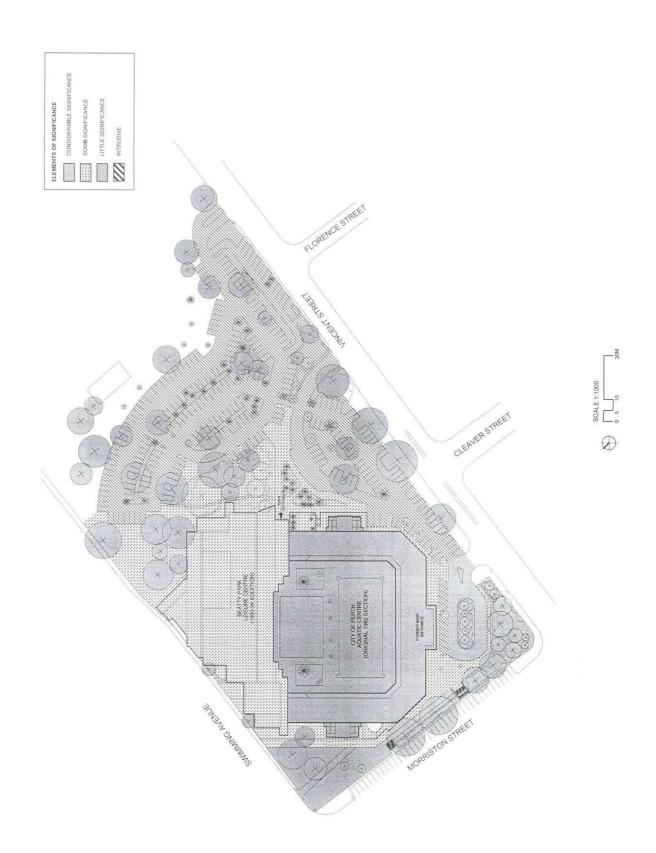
Beatty Park Leisure Centre – Site Plan (Elements of Significance).
